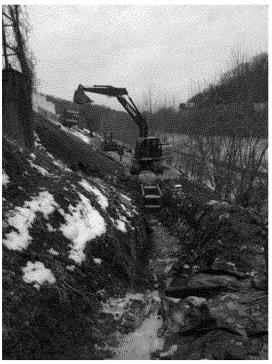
; Taken on 01/31/14 at 17:07 hours by START GN. Installing second trench box in excavation.
